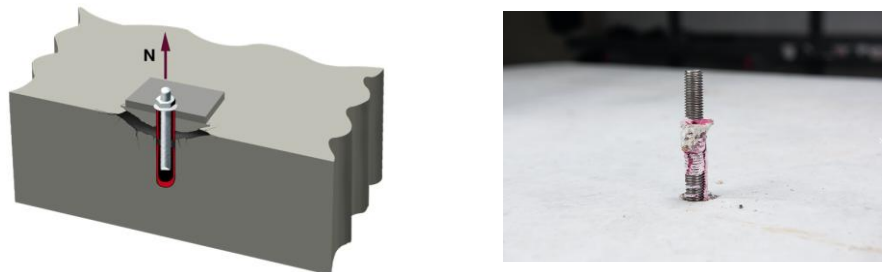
Bond failure/ Pull-out failure of adhesive anchors under tension loading
